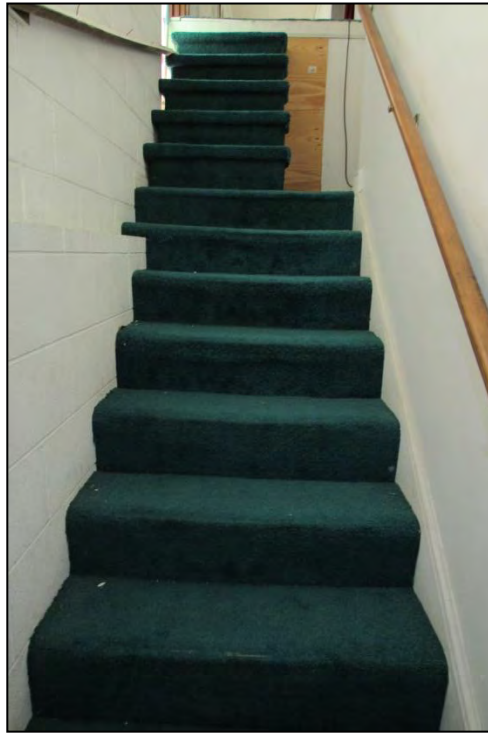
Staircase Leading to Baptismal Pool, Looking Southeast.
